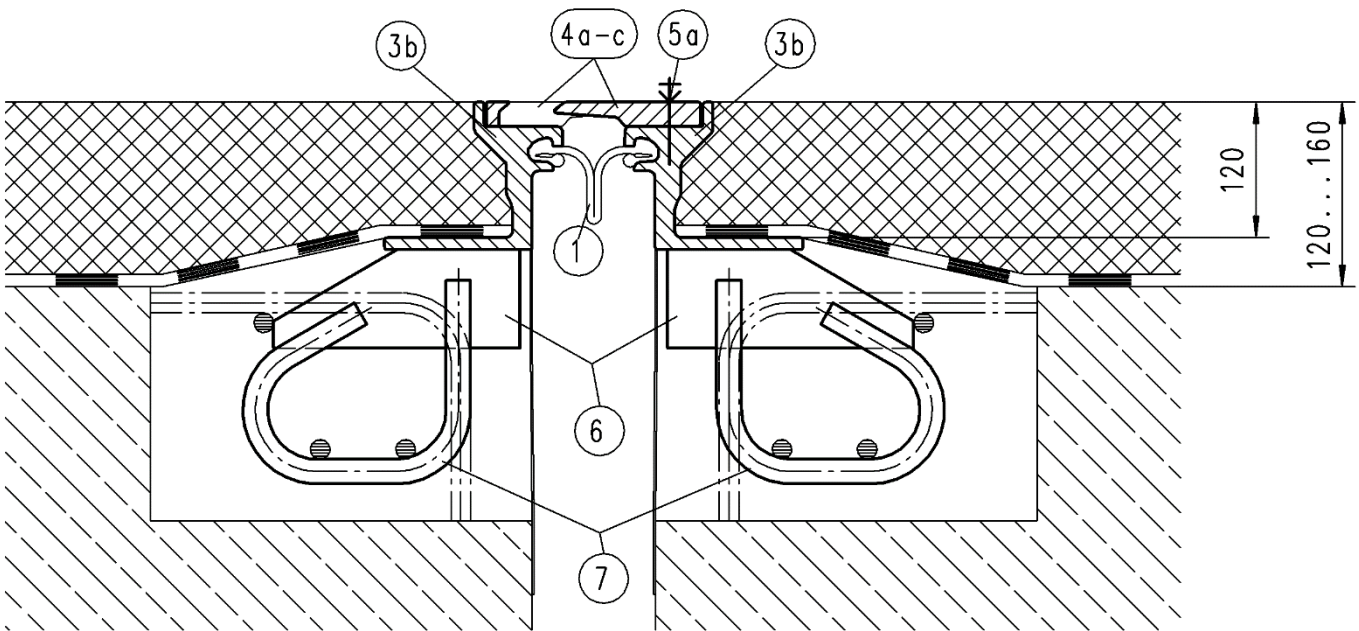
Exemplary cross section of the nosing expansion joint MAURER XC1 Expansion Joint with edge profile XC1/120 including anchorage, pavement thickness 120 mm
